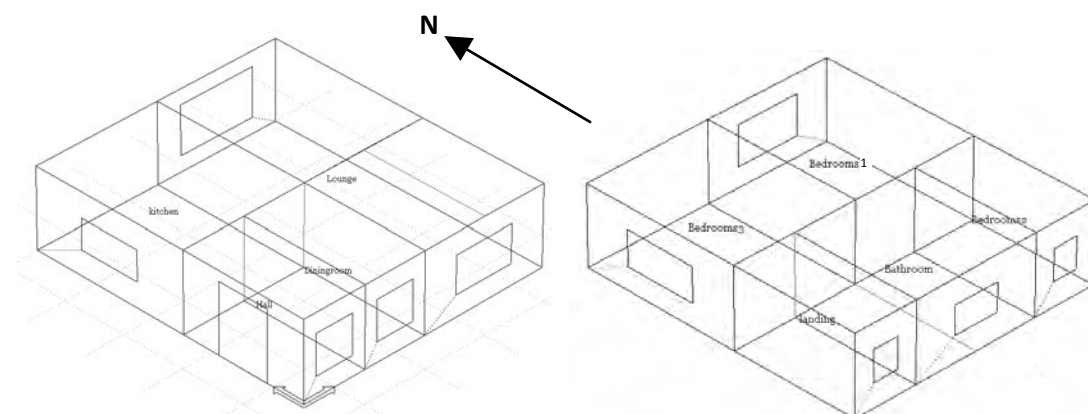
ESP-r diagram of ground floor (left) and first floor (right) of modelled dwelling
